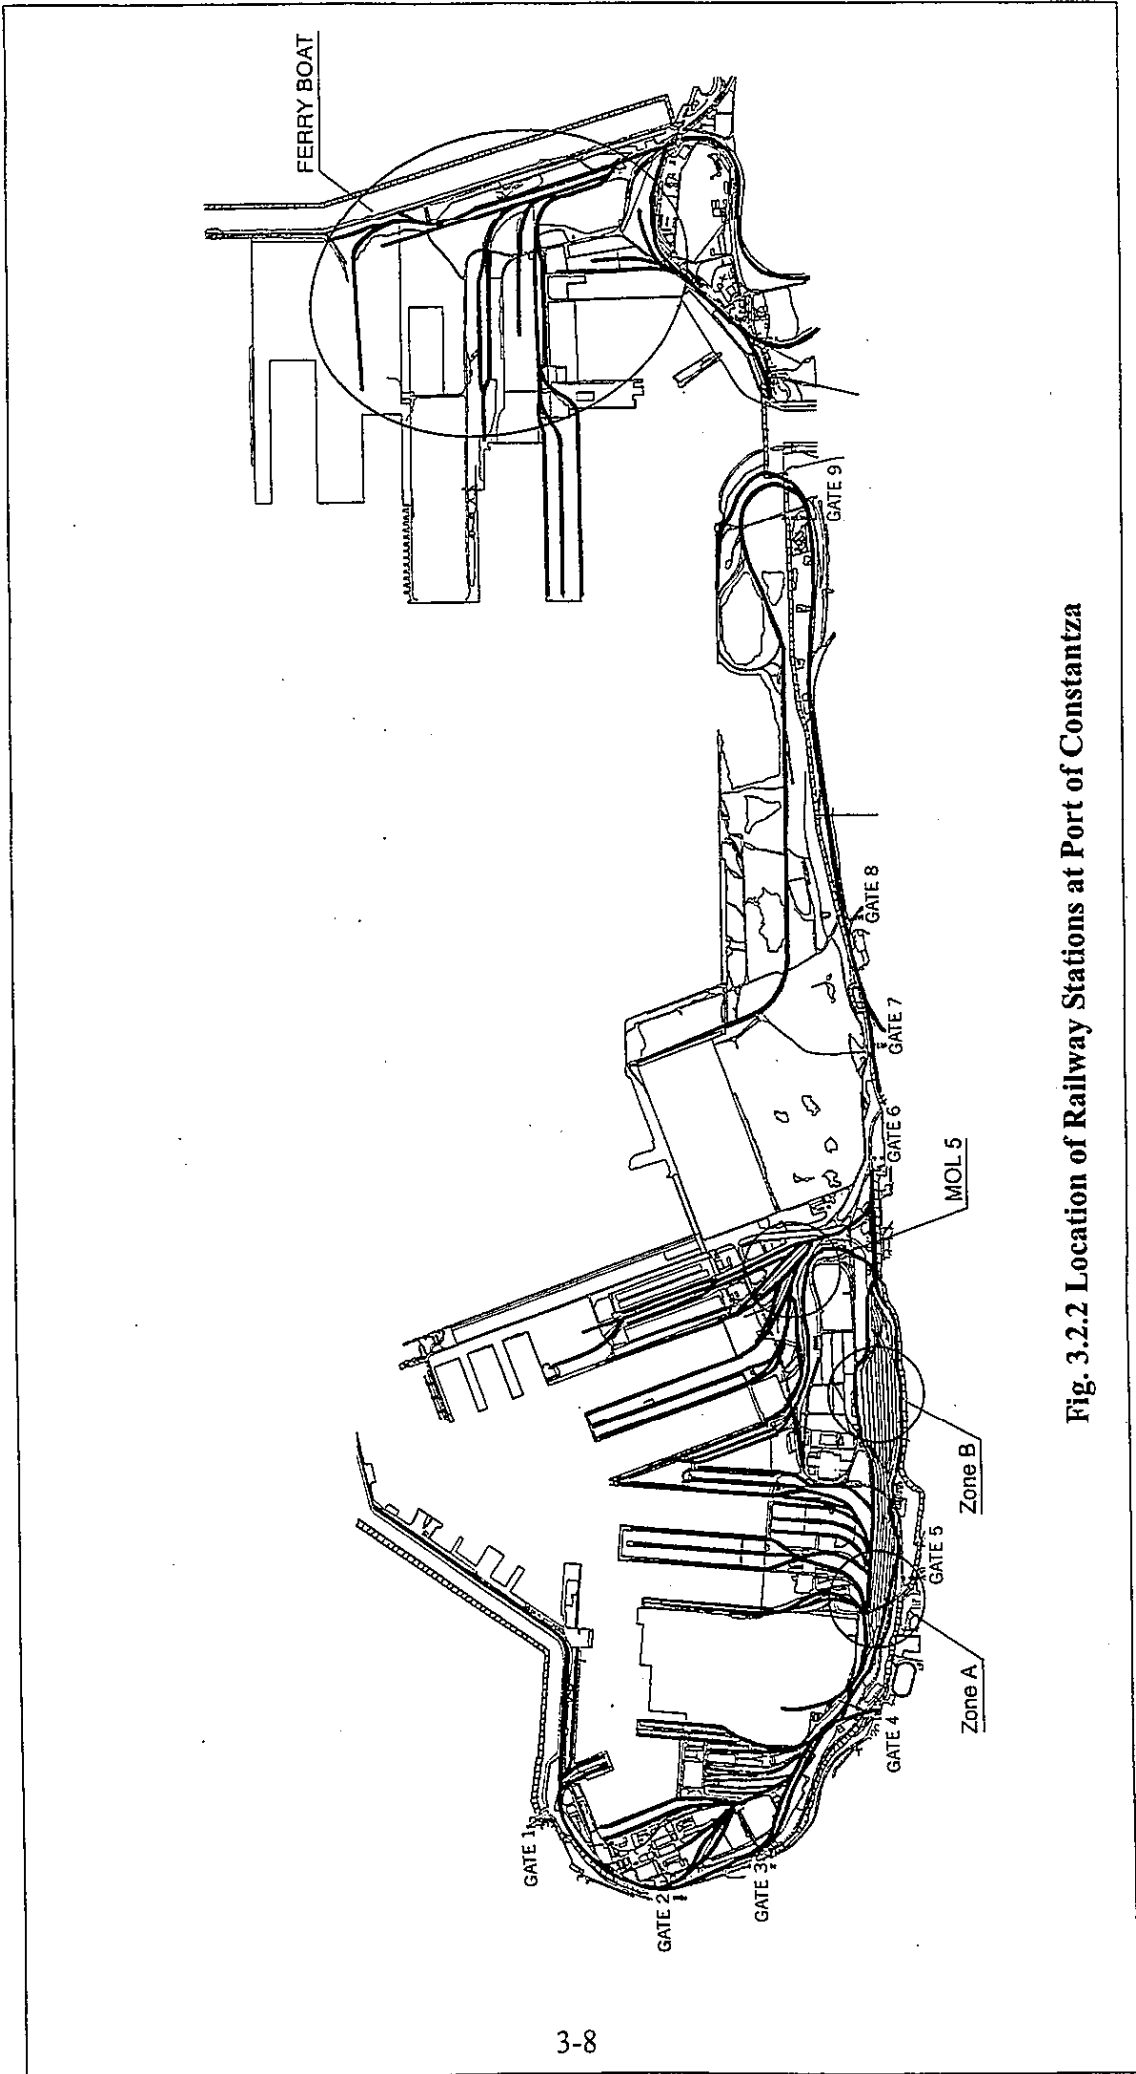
Location of Railway Stations at Port of Constantza
